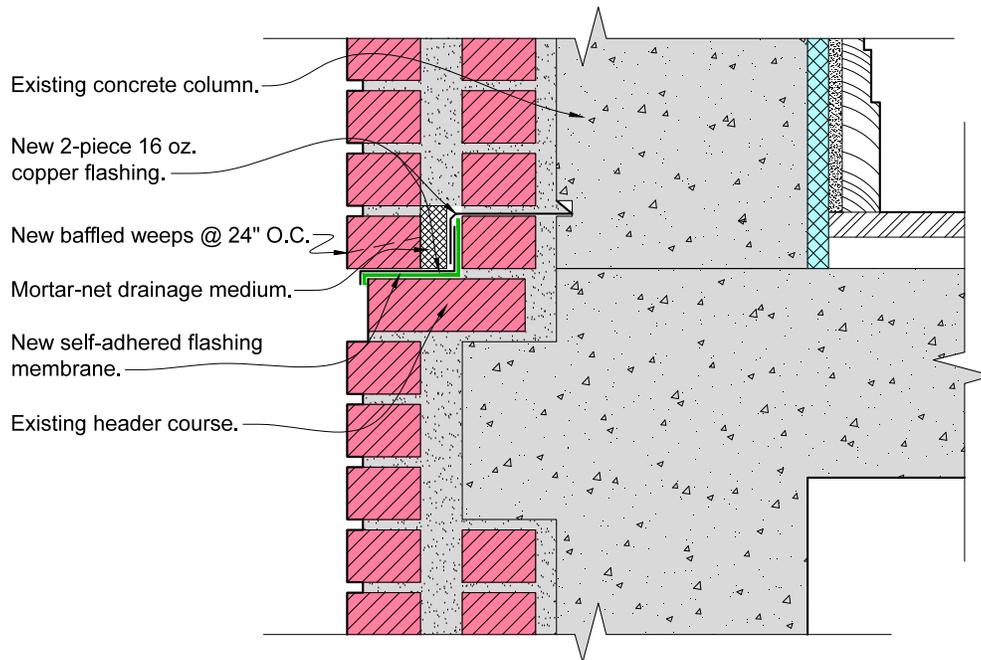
(5): Option 1 Restoration Approach Through-Wall Flashing Retrofit
